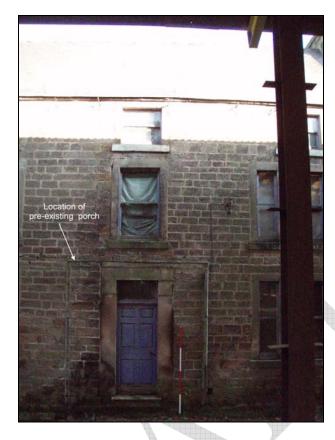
Photograph of the main entrance to the house on the south-west façade with evidence of a pre-existing porch (facing north-east) (scale = 2m).
